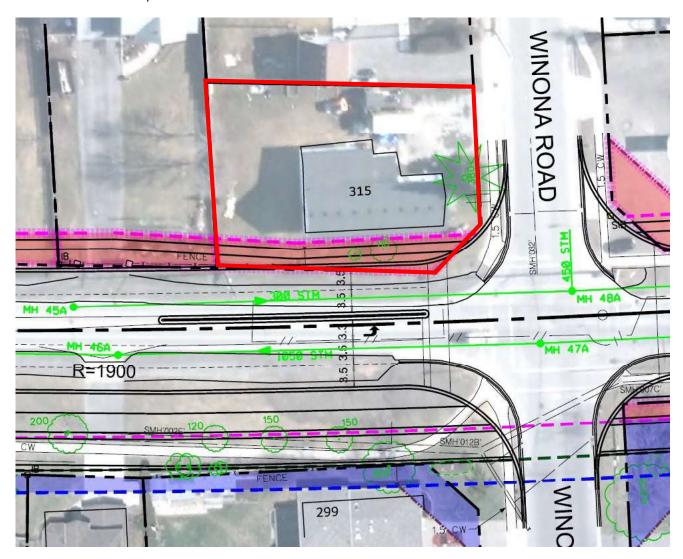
Proposed work in the vicinity of 315 Winona Road (outlined in red)
